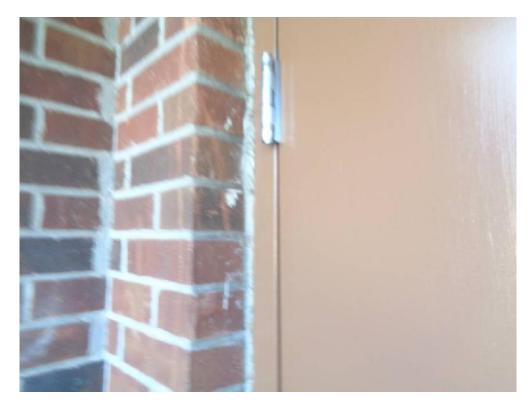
Typical view of white door caulk (DCA, non-asbestos) of the exterior doors.
